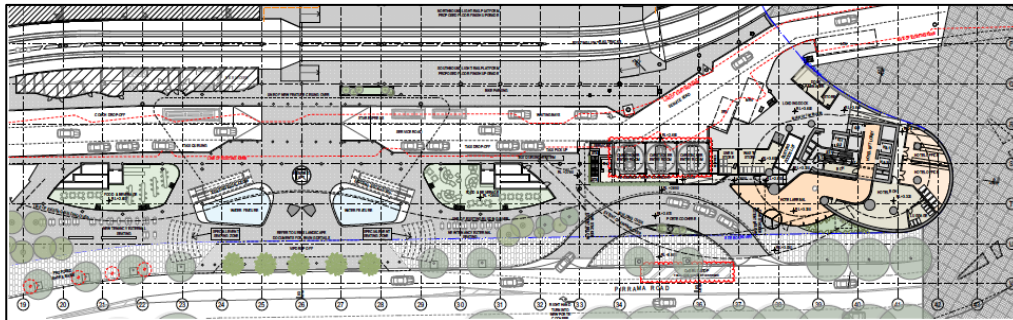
Access Road and Modified Loading Dock (FJMT, April 2017)
